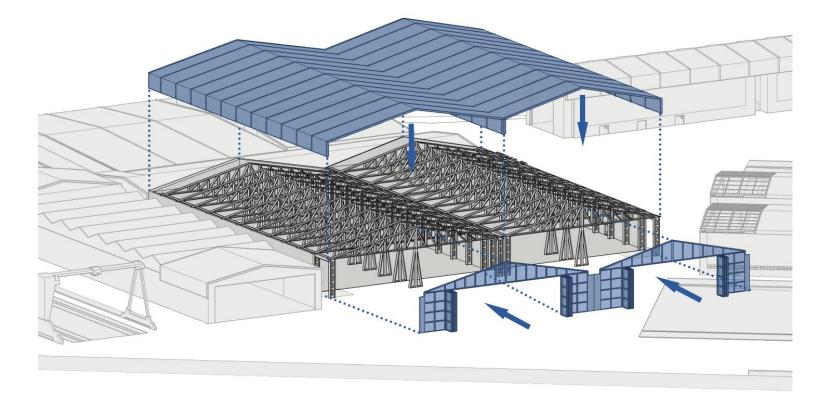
| 3D axonometric view of new roof section and curtain wall façade being added to the buildings of cluster "D"
